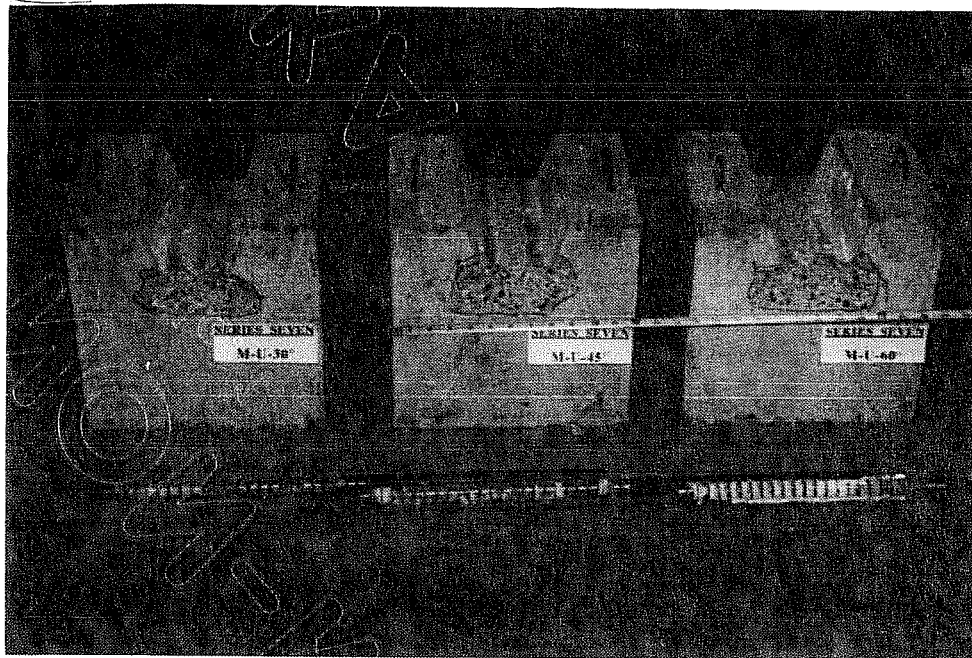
Uncoated manufactured bar Type A pullout specimens after failure, top load = 10 kips, concrete strength = 4750 psi.
